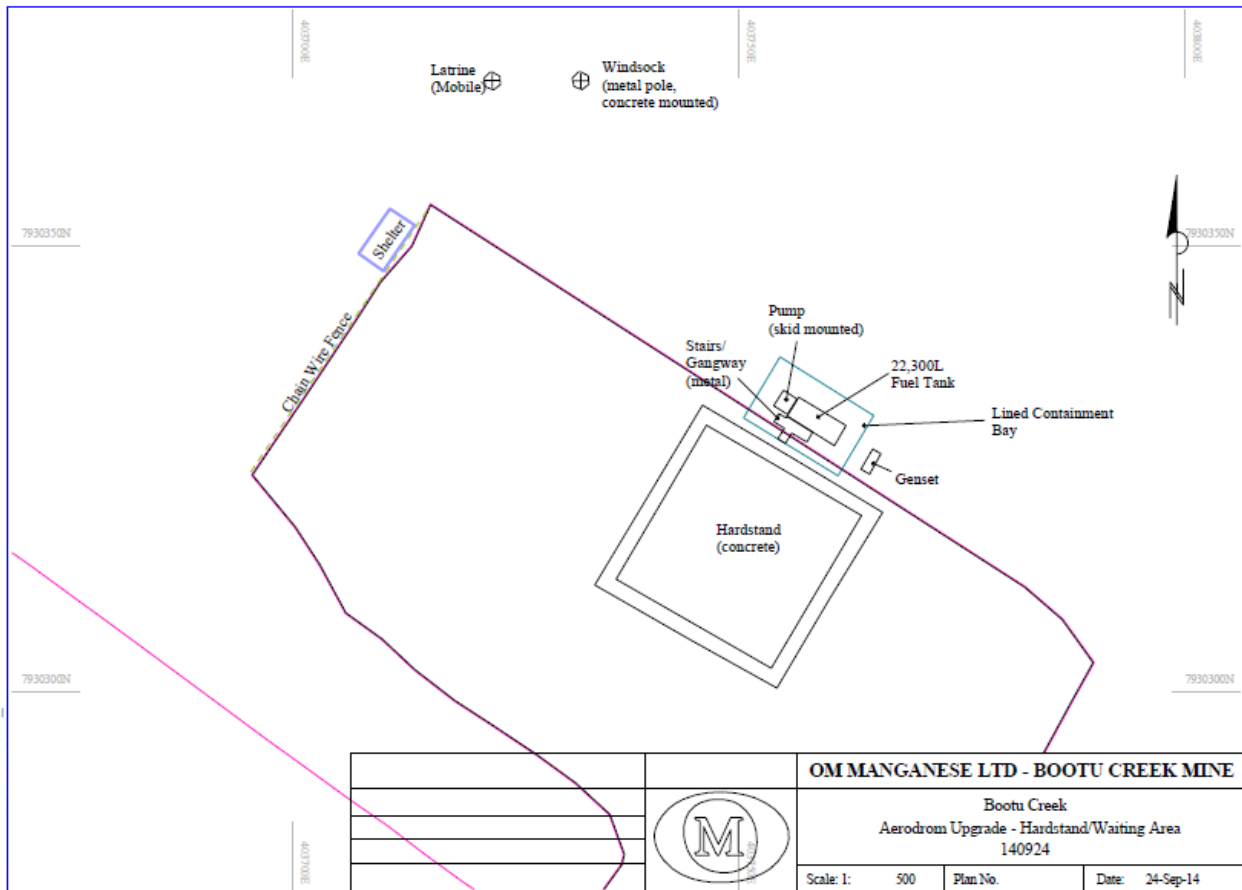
Plan of the aerodrome hardstand waiting area as constructed at the BCMM.
